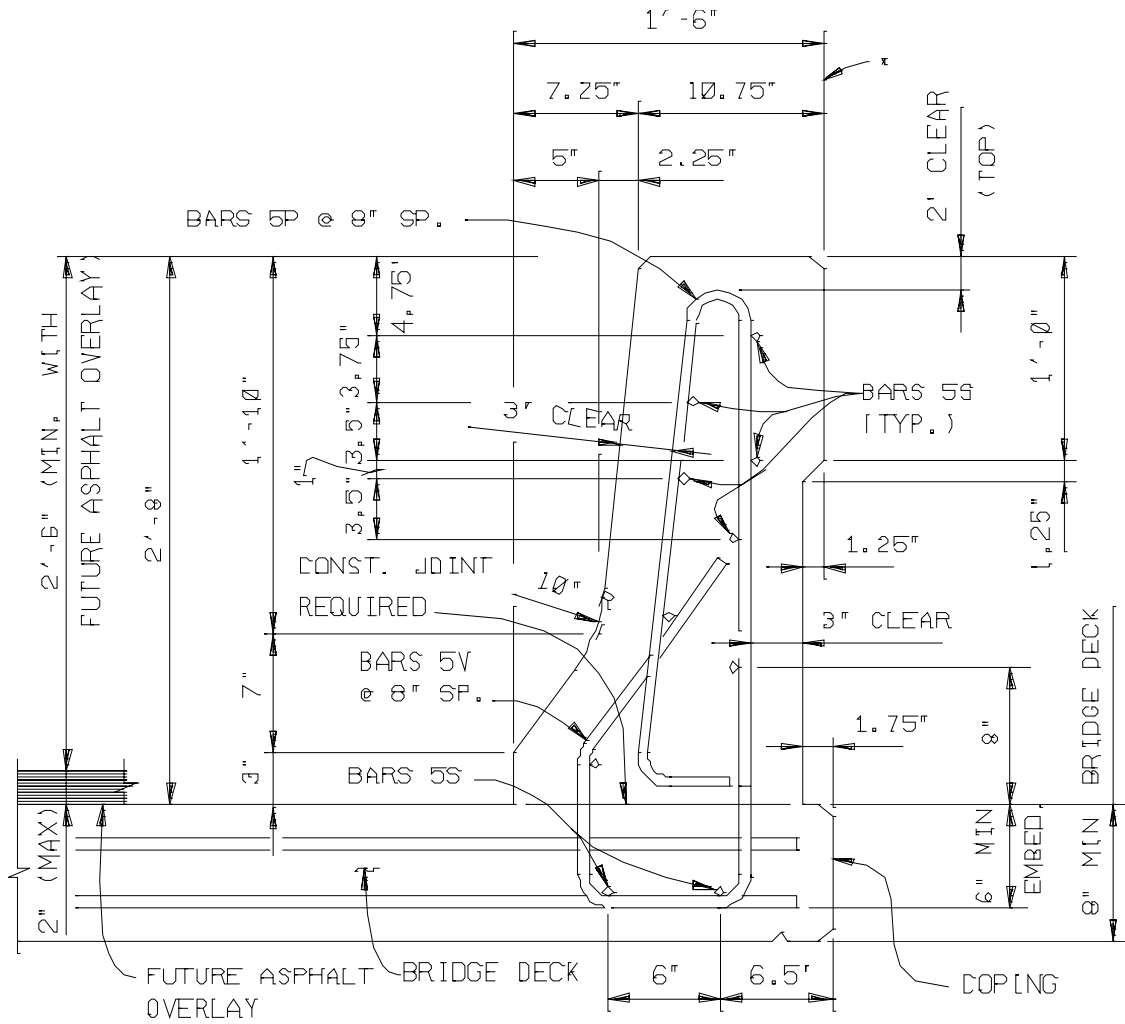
Typical Reinforcement Detail in 32 in. Barrier.
